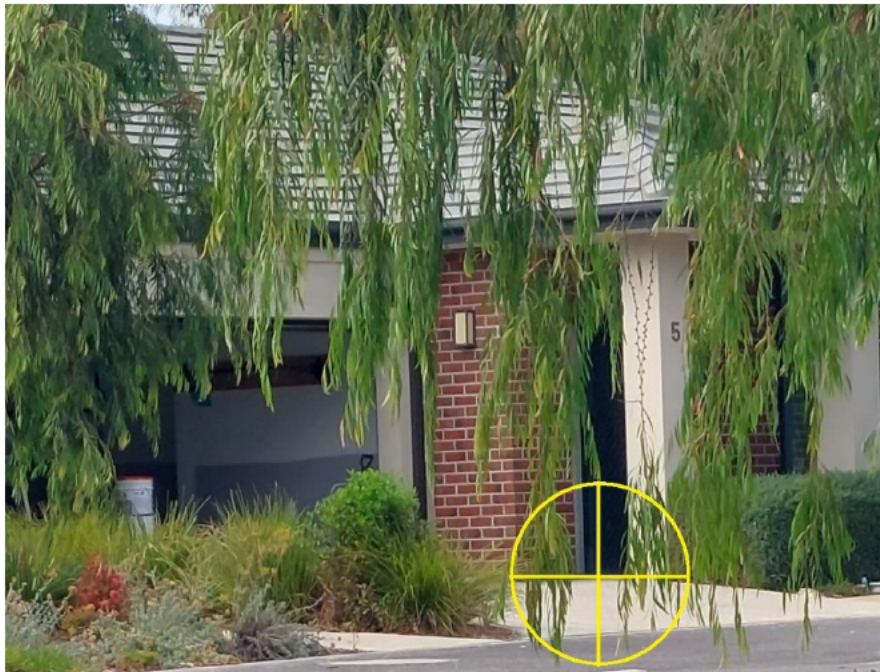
View my dumpy level sighted on my friend's floor level at Rivervue Retirement Village.
